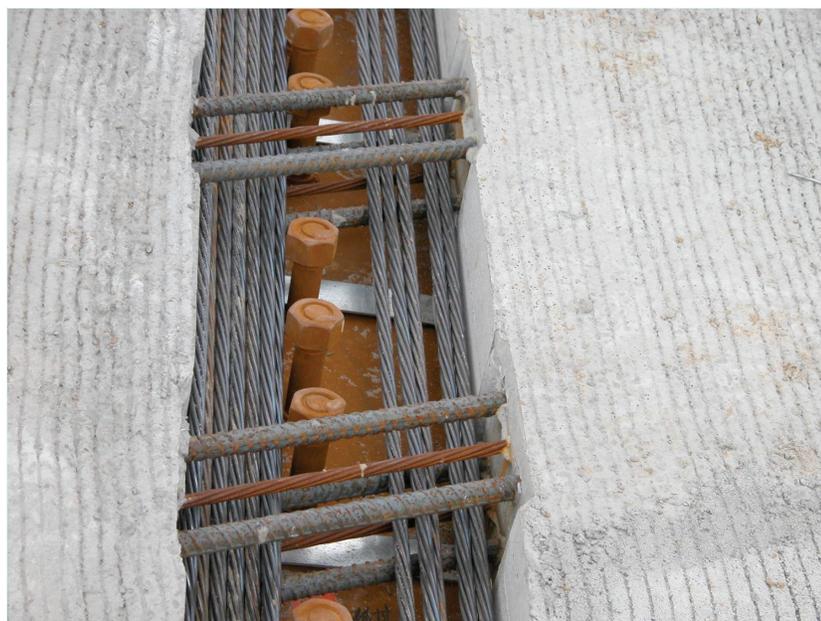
Strands in position in channel over girder on Skyline Bridge.
